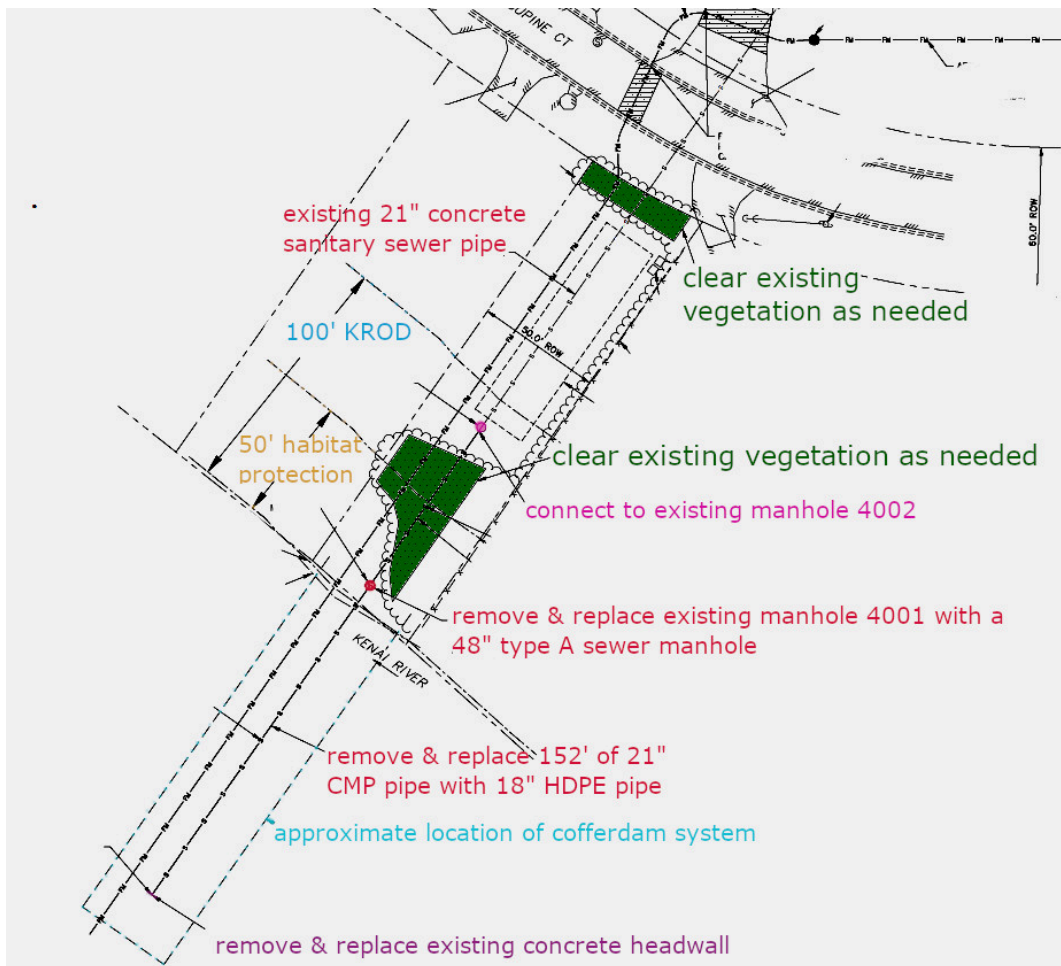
Proposed area of vegetation removal, excavation, staging of equipment, demolition and installation.
